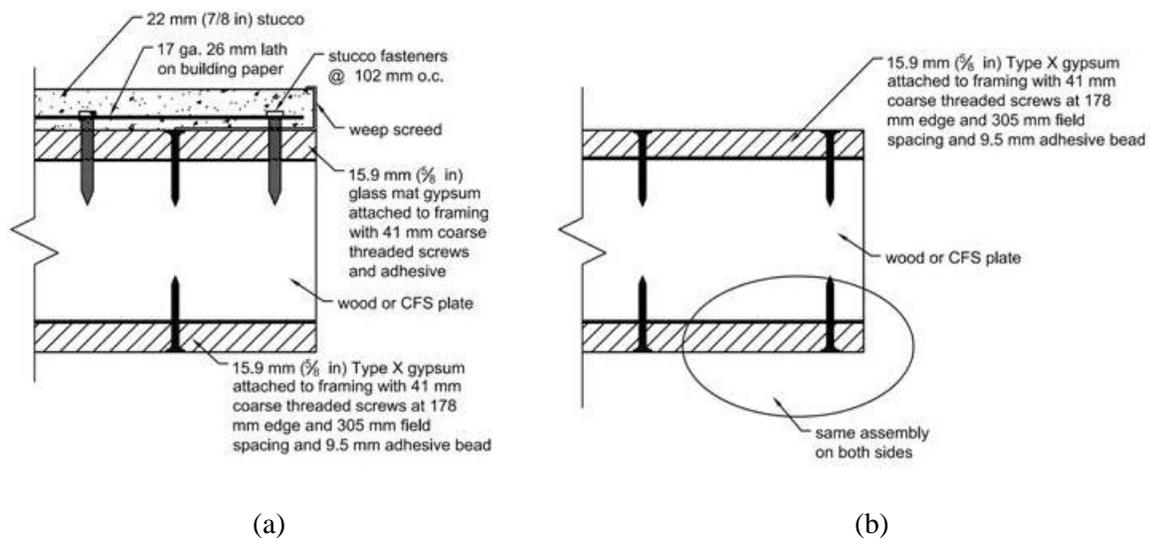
Composition of enhanced (a) stucco and (b) gypsum walls as built shown in plan [5]
